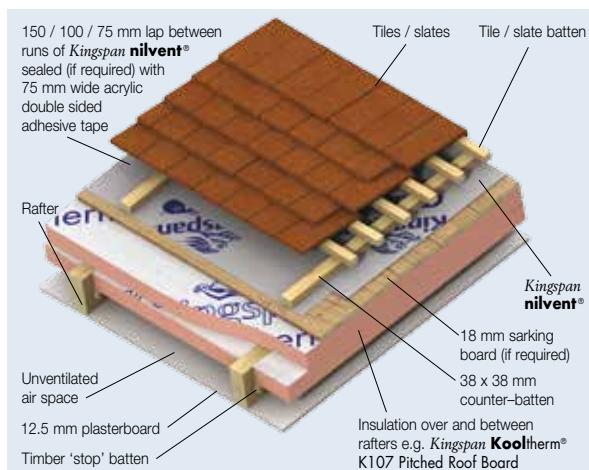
Insulation Over Rafters – Sarking Board / No Sarking Board – Battens & Tiles
